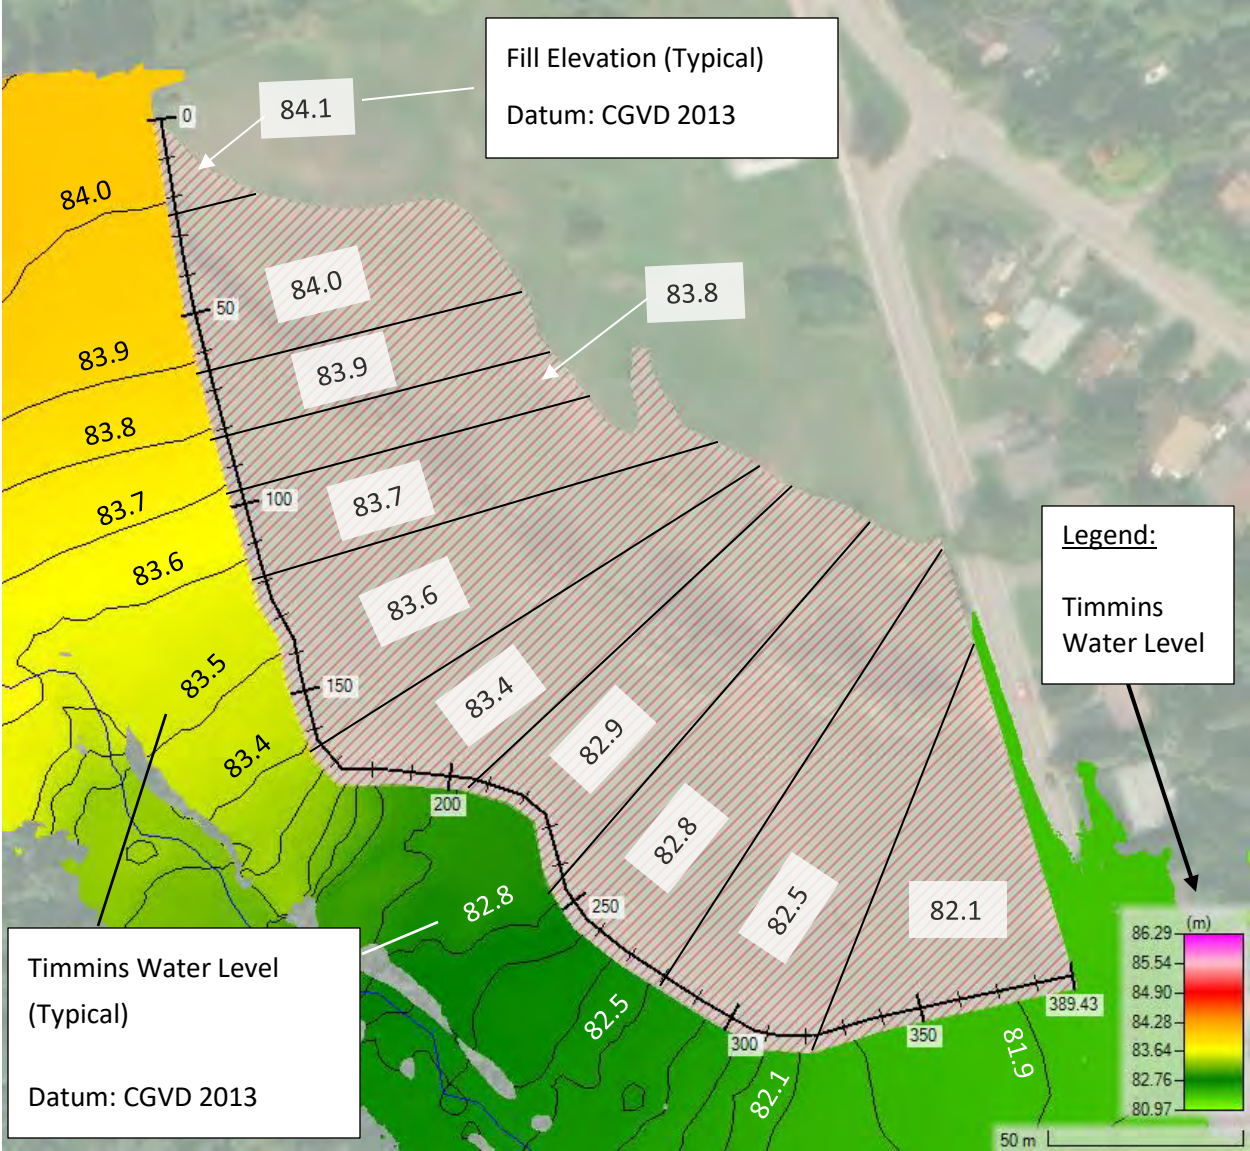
Proposed Fill Elevations for Subject Permit Application to Remove Lands from Regulatory Floodplain
